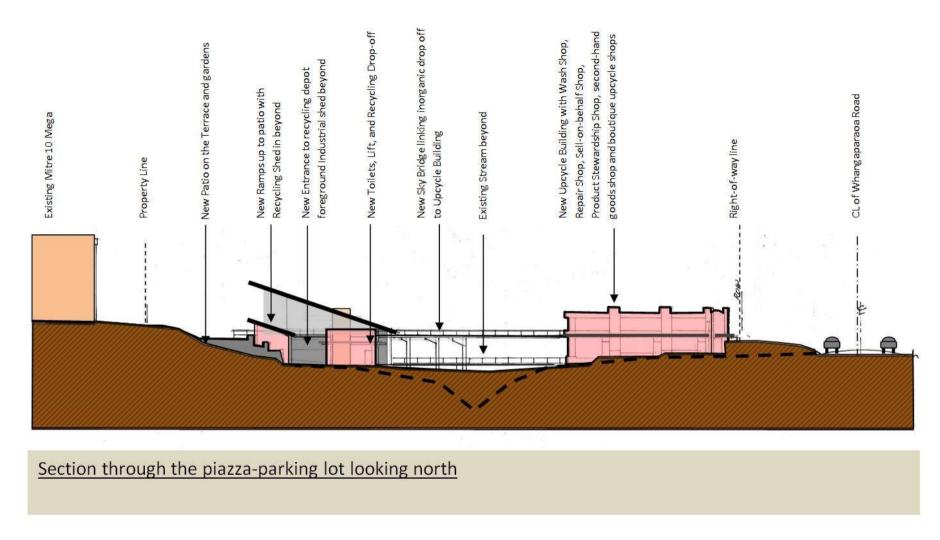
Sectional view of the proposed CBRD through piazza looking north.
